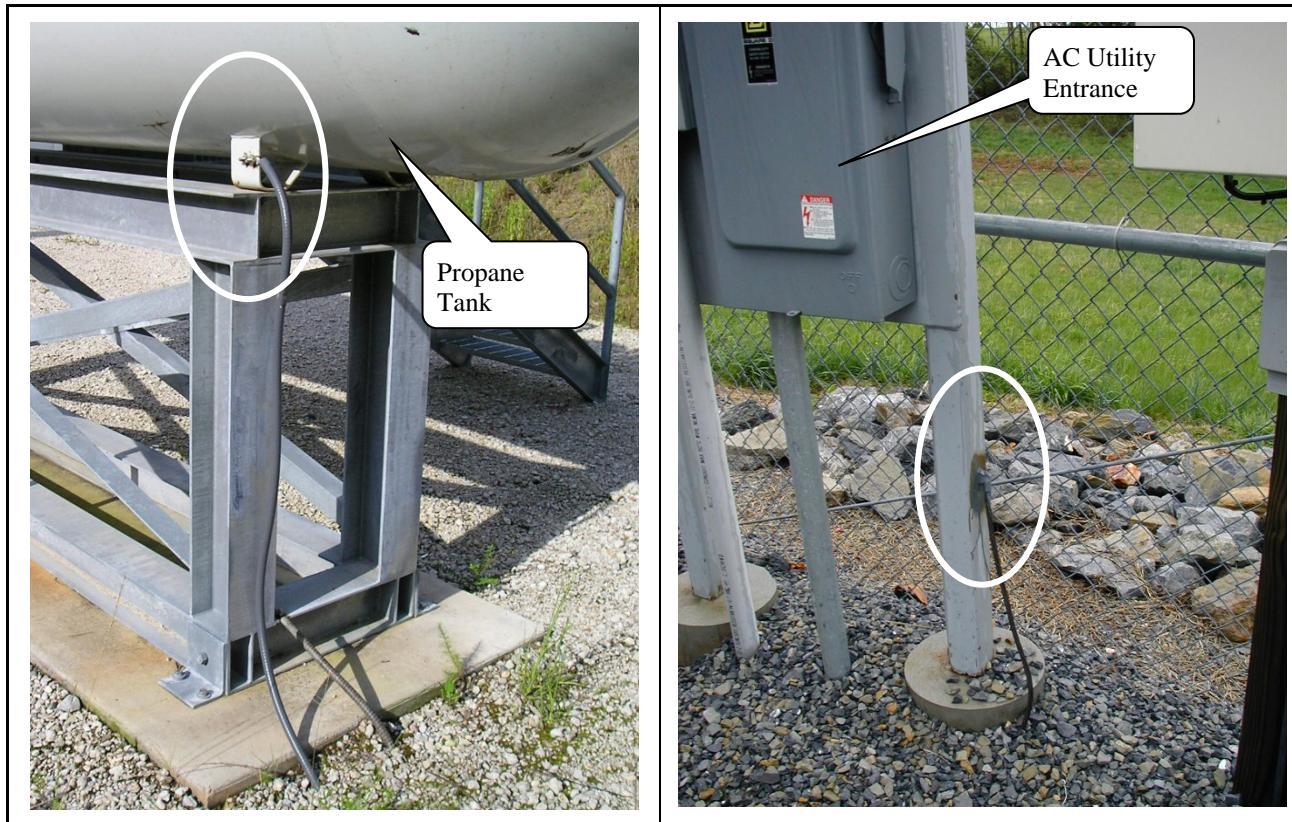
Grounding of Metallic Objects Attached to Building Exterior
